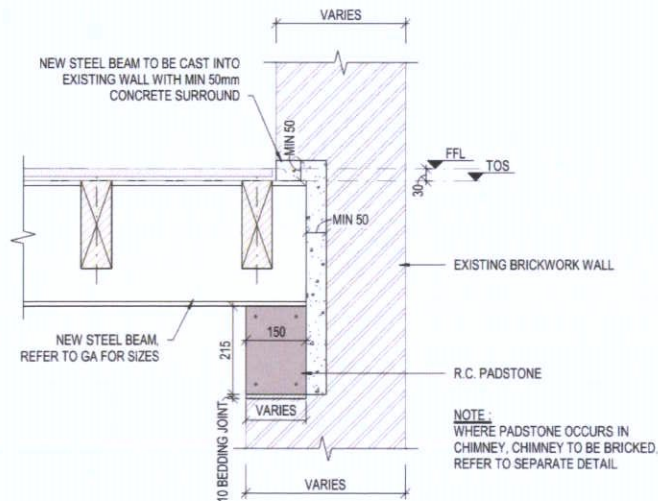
Typical Padstone Detail for Steel to Masonry Wall
